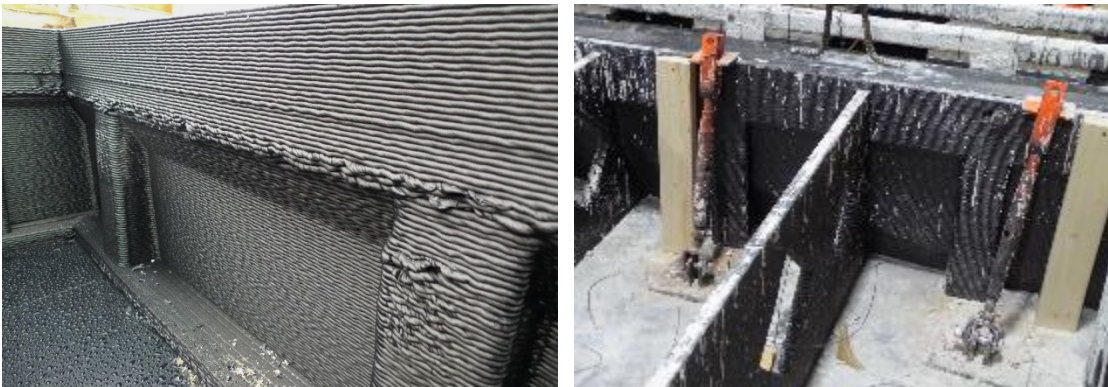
Left: in initial designs, a flange was printed at the bottom of the molds to attach them to the casting bed. Right: the final design used hold downs to keep the molds in place by attaching the hold down to the top of the mold and the casting bed.
